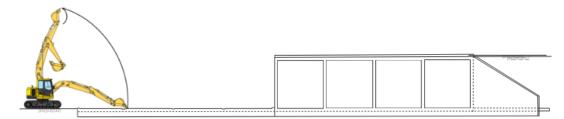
Demolition Stage 3 Segment 1 completed (Source: FBE)
